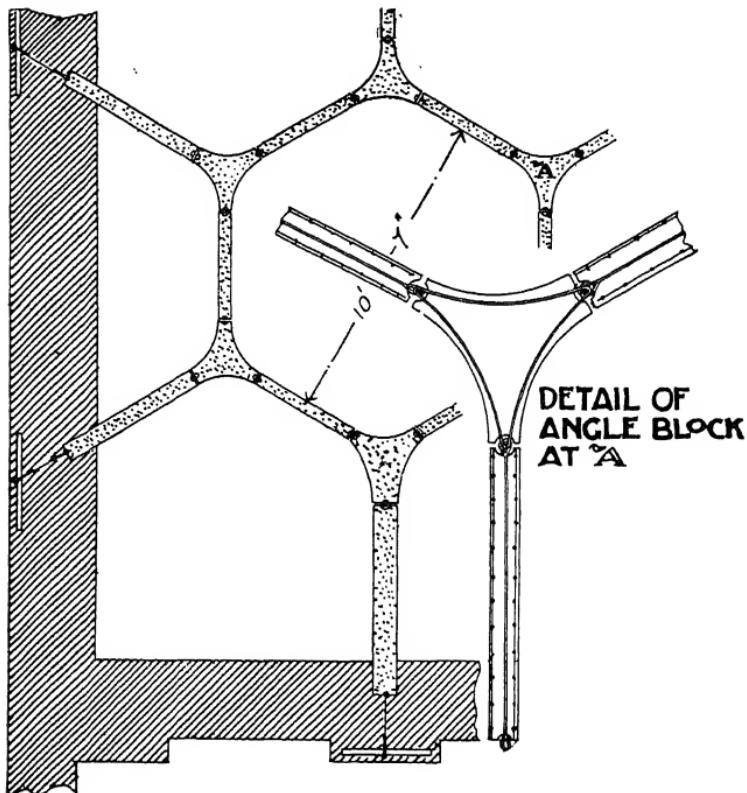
Grain-Silos of Reinforced Concrete at Galatz, Roumania.
